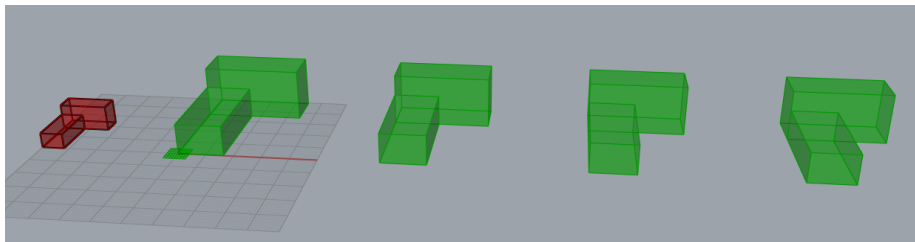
The available plates and required floorspace per building indicated that 4 reuse buildings is feasible.
